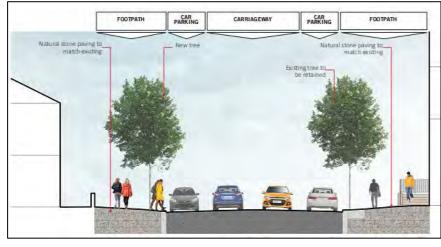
Section and plan illustrating landscaping along Sandy Row
